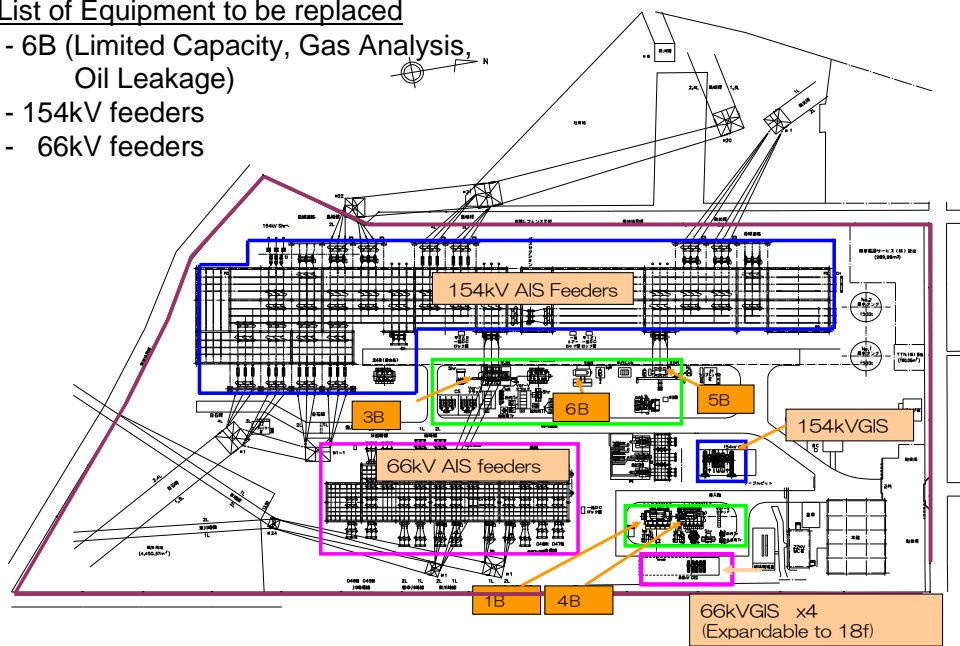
The layout of 154/66kV Air-insulated Substation (Existing)
